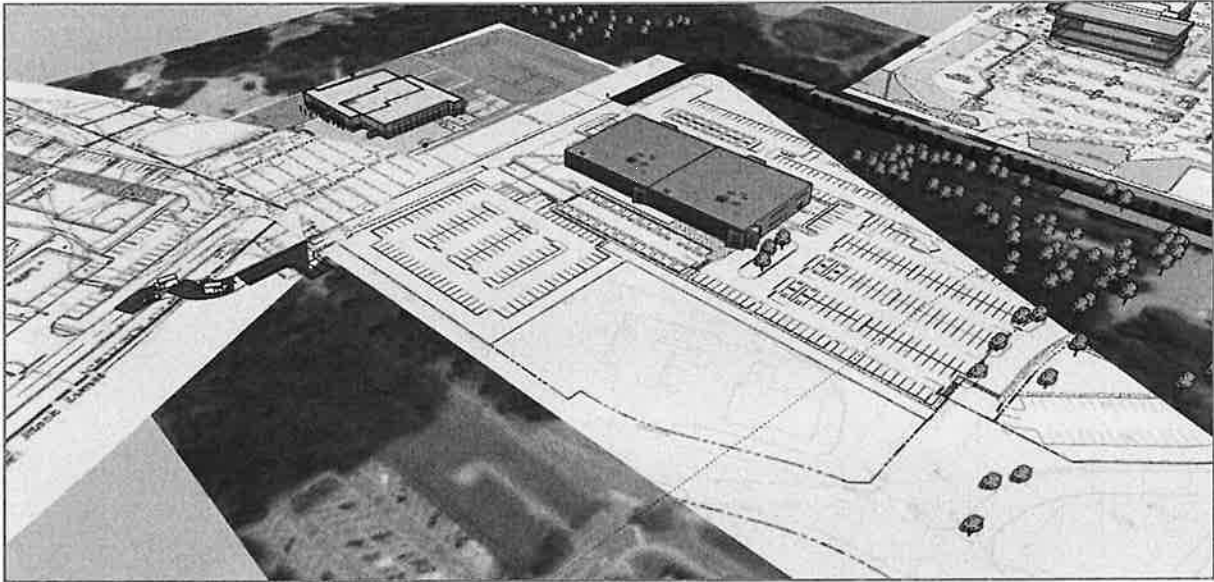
Concept Plans for Subareas A and B of Redevelopment Plan spliced into approved site plan for the adjacent K-Land multifamily residential project to show extension of Castlebuono-Salerno Avenue between Subareas A and B to create a "T" intersection with Caudina Avenue.
